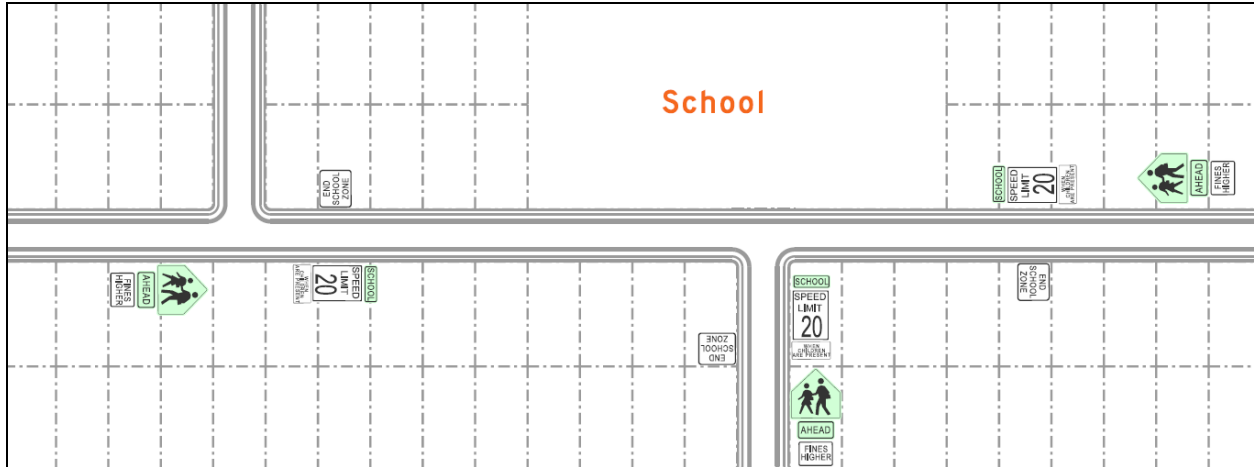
A typical layout of school zone signage for a school located at a T intersection.
